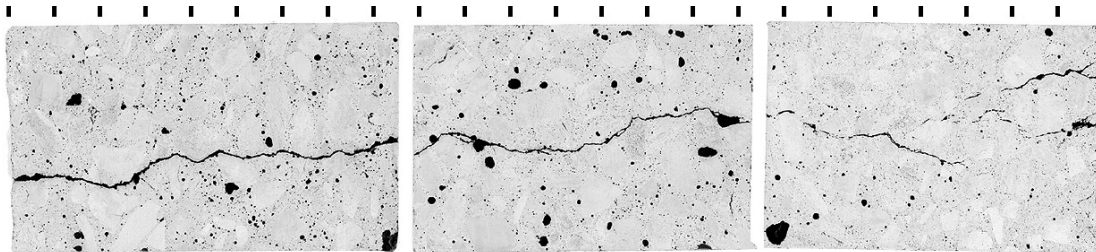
POLISHED SLABS FROM AIRPORT FOXTROT. SLABS ORIENTED TO SHOW CROSS-SECTION THROUGH PAVEMENT, PAVEMENT SURFACE AT RIGHT HAND SIDE, TICK MARKS EVERY 2 CM
